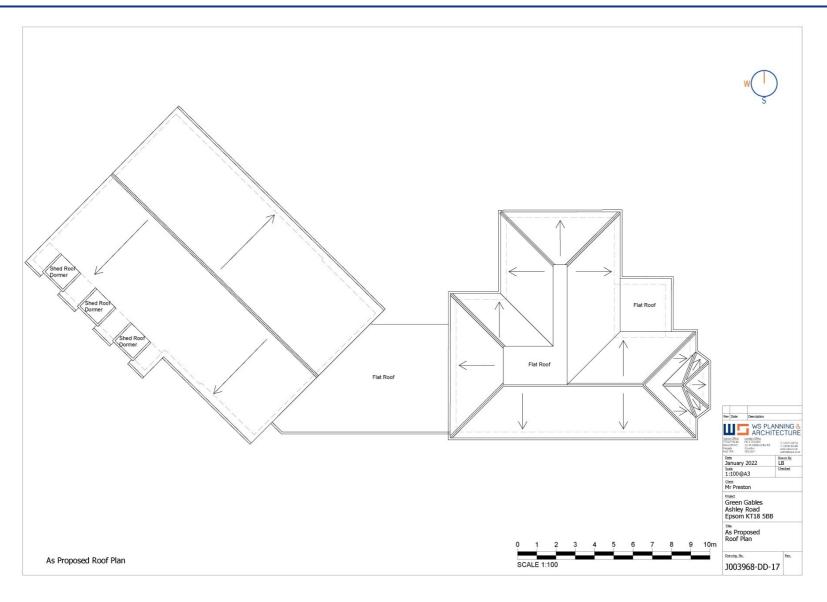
Roof Plans (Drawing Number J003968-DD-17)
